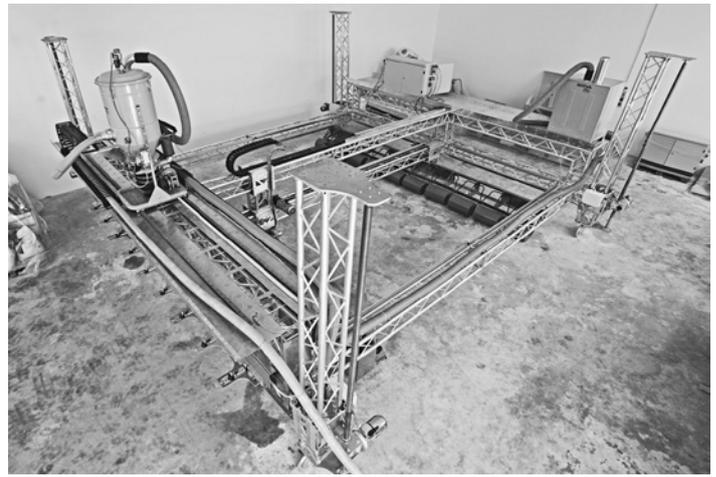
D-Shape 3D printer (www.d-shape.com, 2016)
